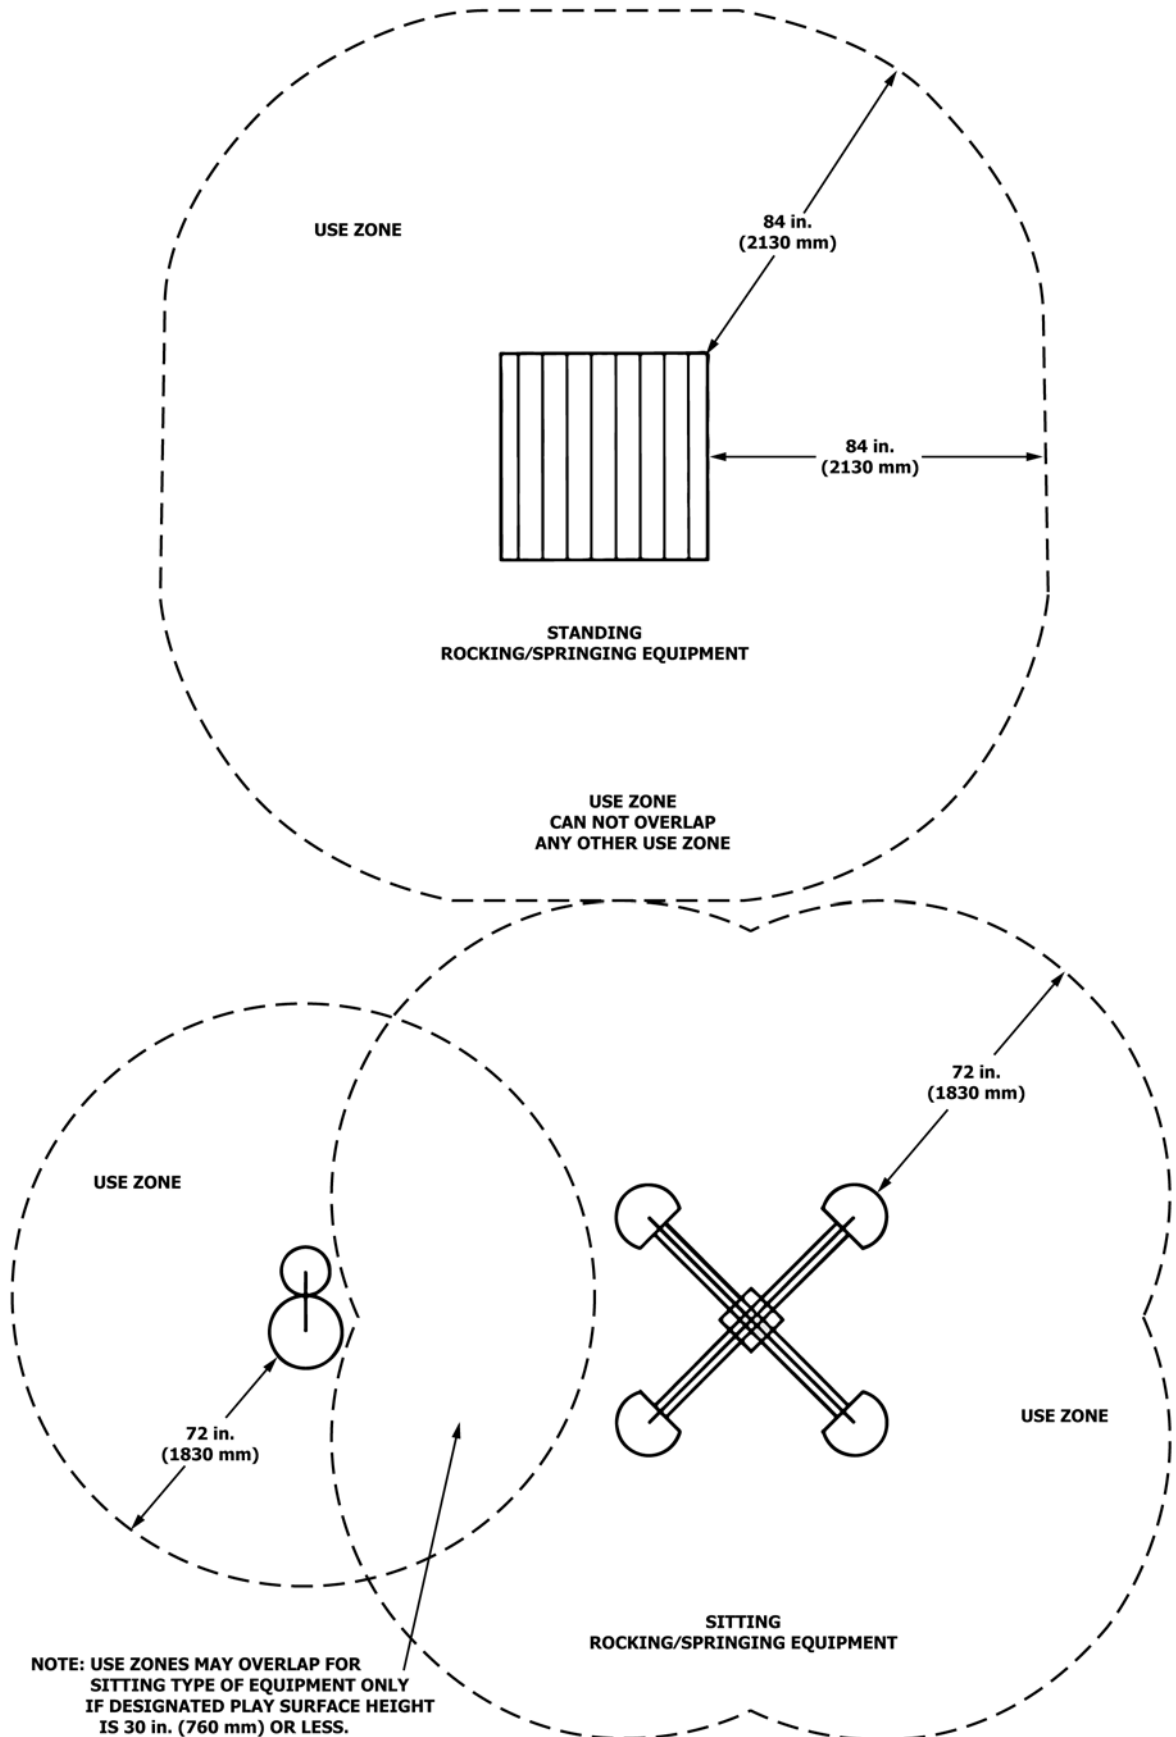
Use Zones for Rocking/Springing Equipment
